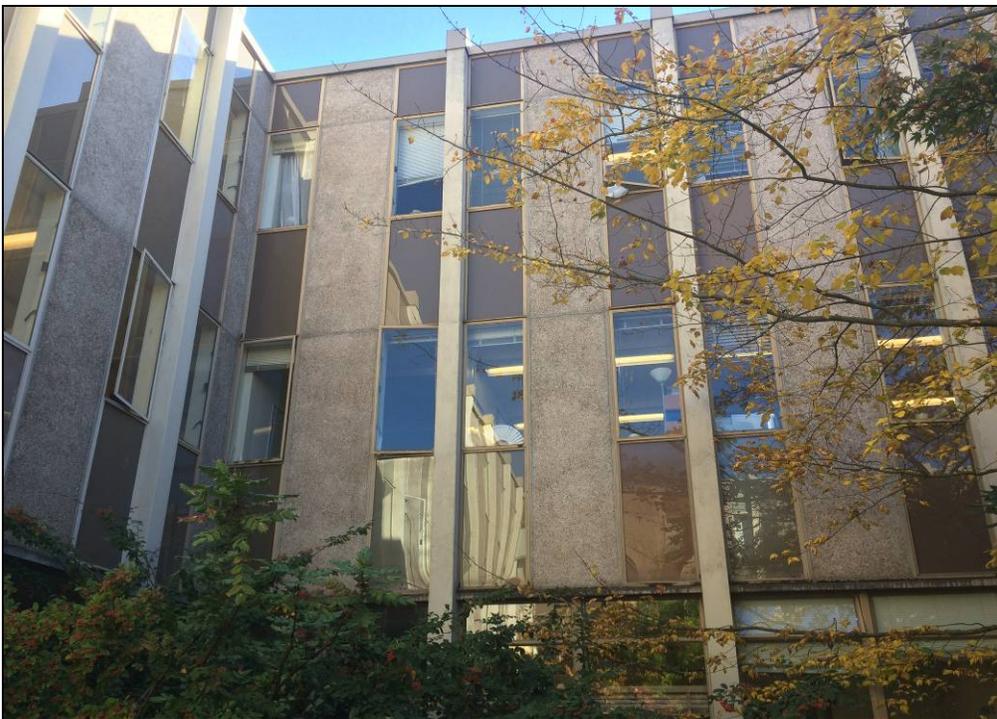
Detail view showing concrete columns, window bays, upper level spandrel and precast concrete panels.
